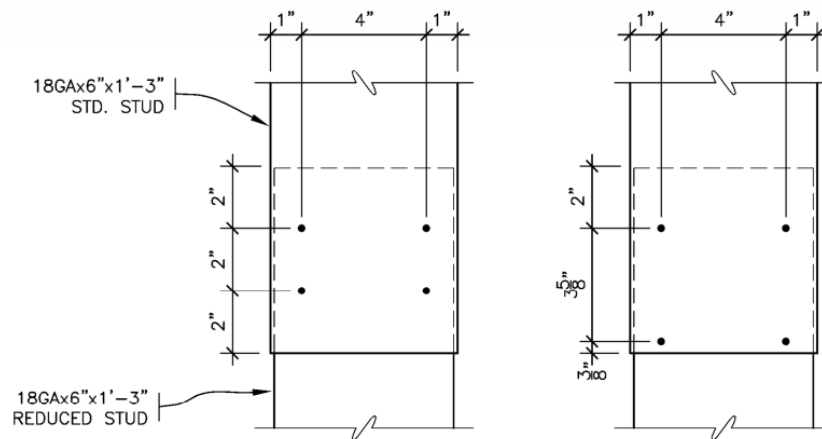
Fastener test patterns showing 2" (50.8mm) and 3/8" (9.5mm) end distances. All the specimens with the additional 14 GA sheet were prepared with the 2" (50.8mm) end distance.
